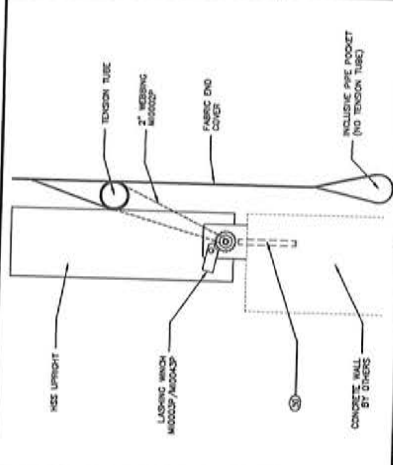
ENDWALL UPRIGHT CONNECTION AT TRUSS - 4X6 HSS
